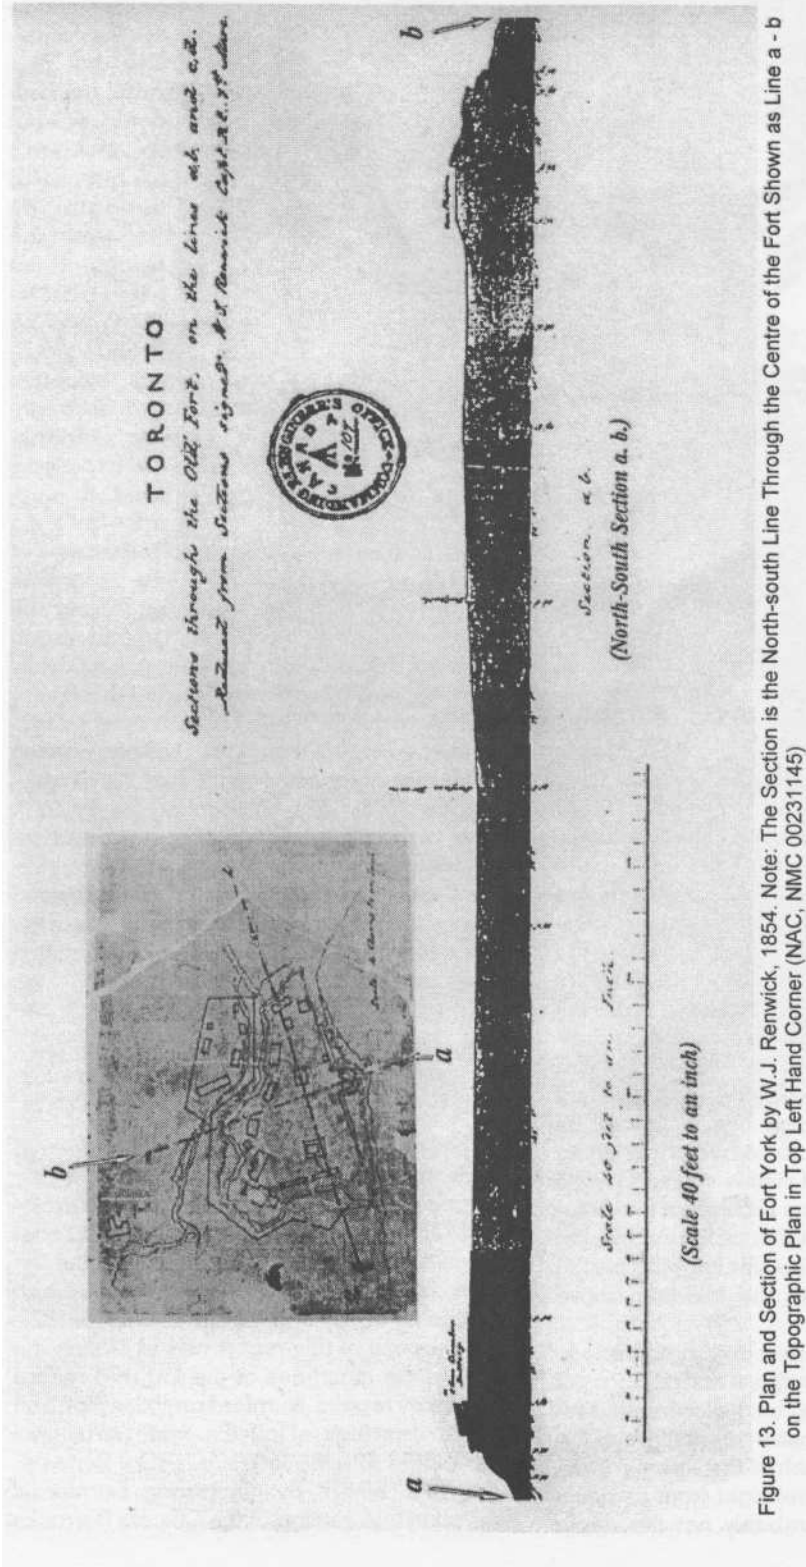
Plan and Section of Fort York by W.J. Renwick, 1854. Note: The Section is the North-south Line Through the Centre of the Fort Shown as Line a - b on the Topographic Plan in Top Left Hand Corner (NAC, NMC 00231145)
